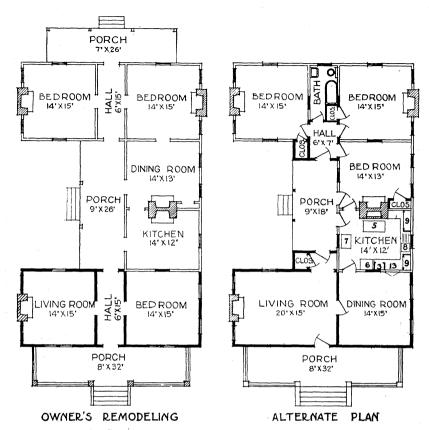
Plan of house 5 as remodeled by ewner, and alternate plan.
